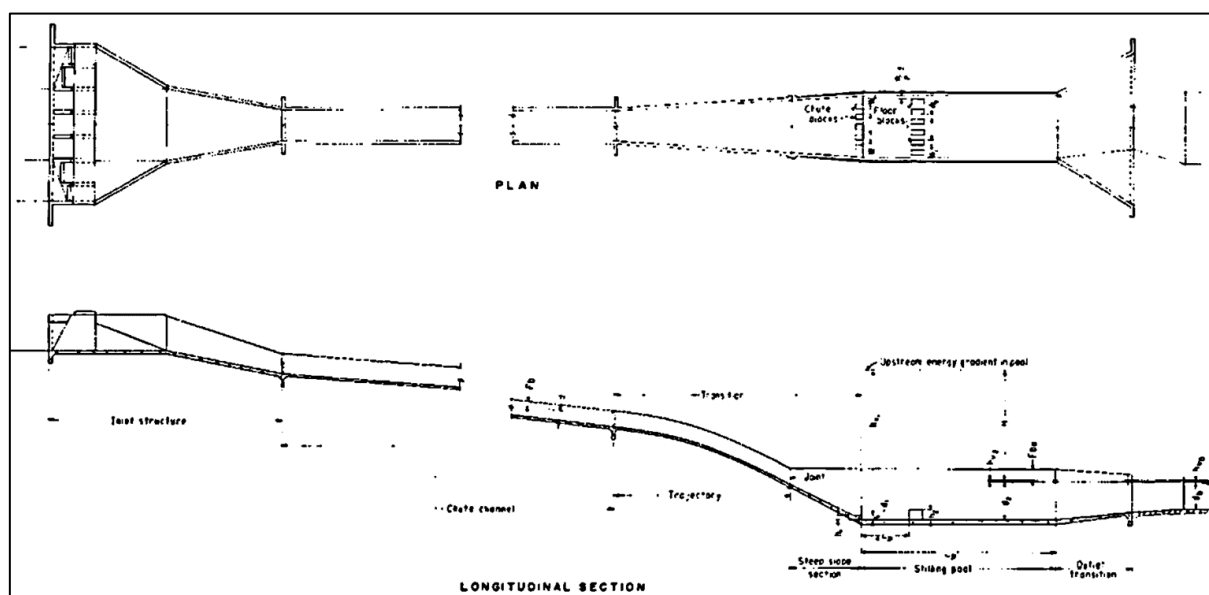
Typical Rectangular Chute Plan and Longitudinal Section
